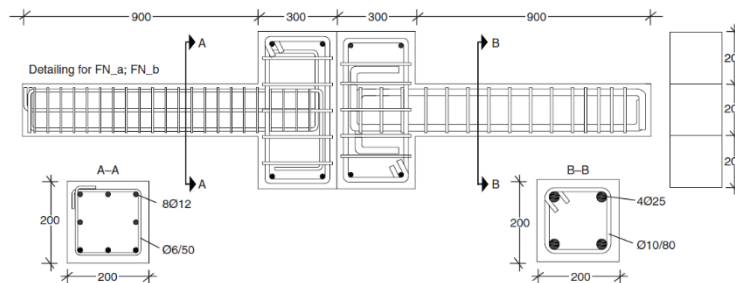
Test assembly: geometry and reinforcement details (dimensions in mm)
